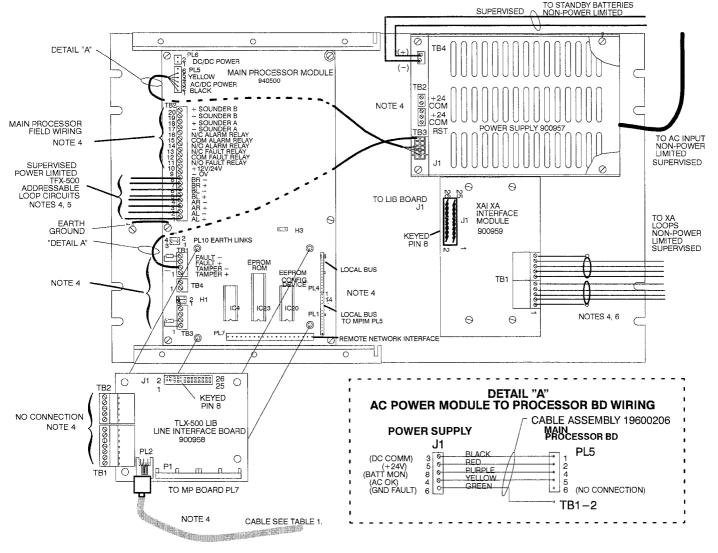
Wiring connections for TFX-AutoPlex Control Panel Assembly.
